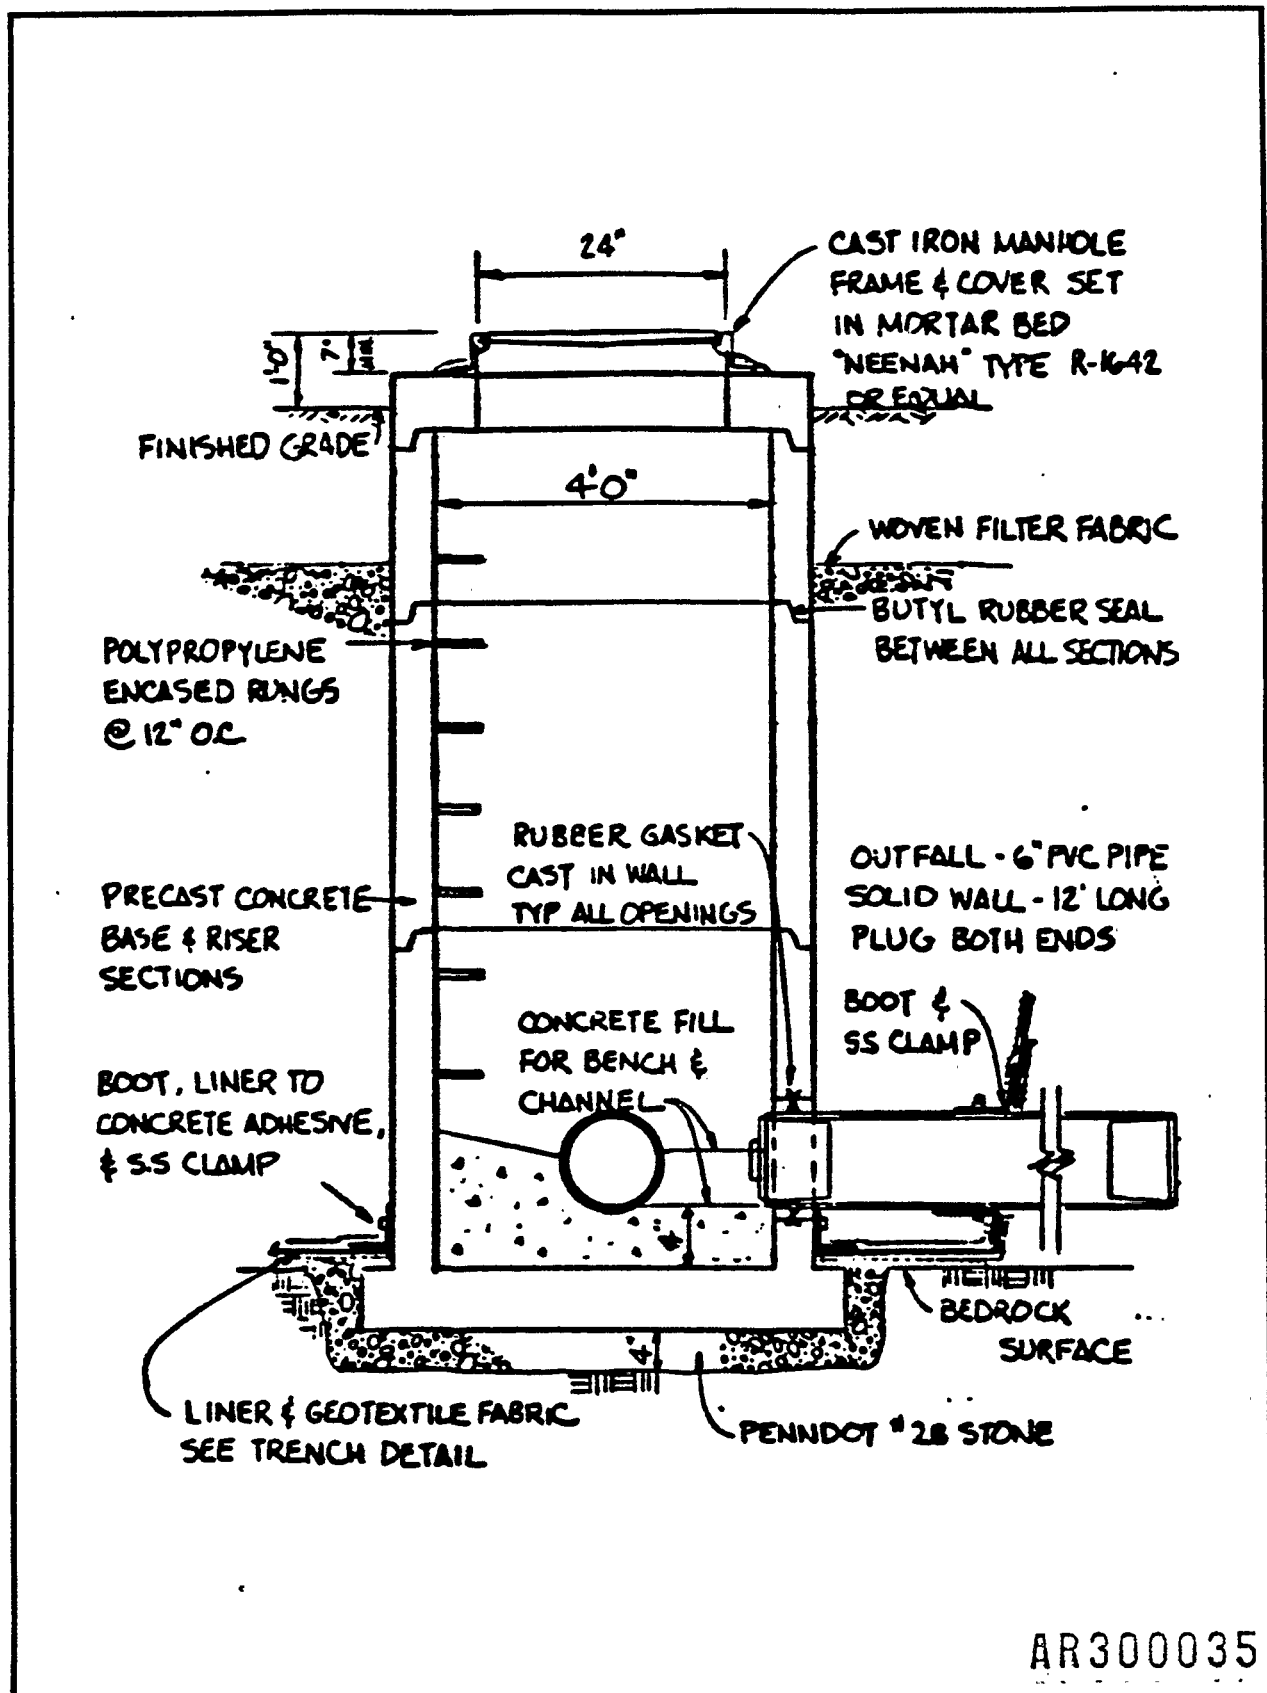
CROSS SECTION OF INTERCEPTOR TRENCH MANHOLE AND OUTFALL PIPE
